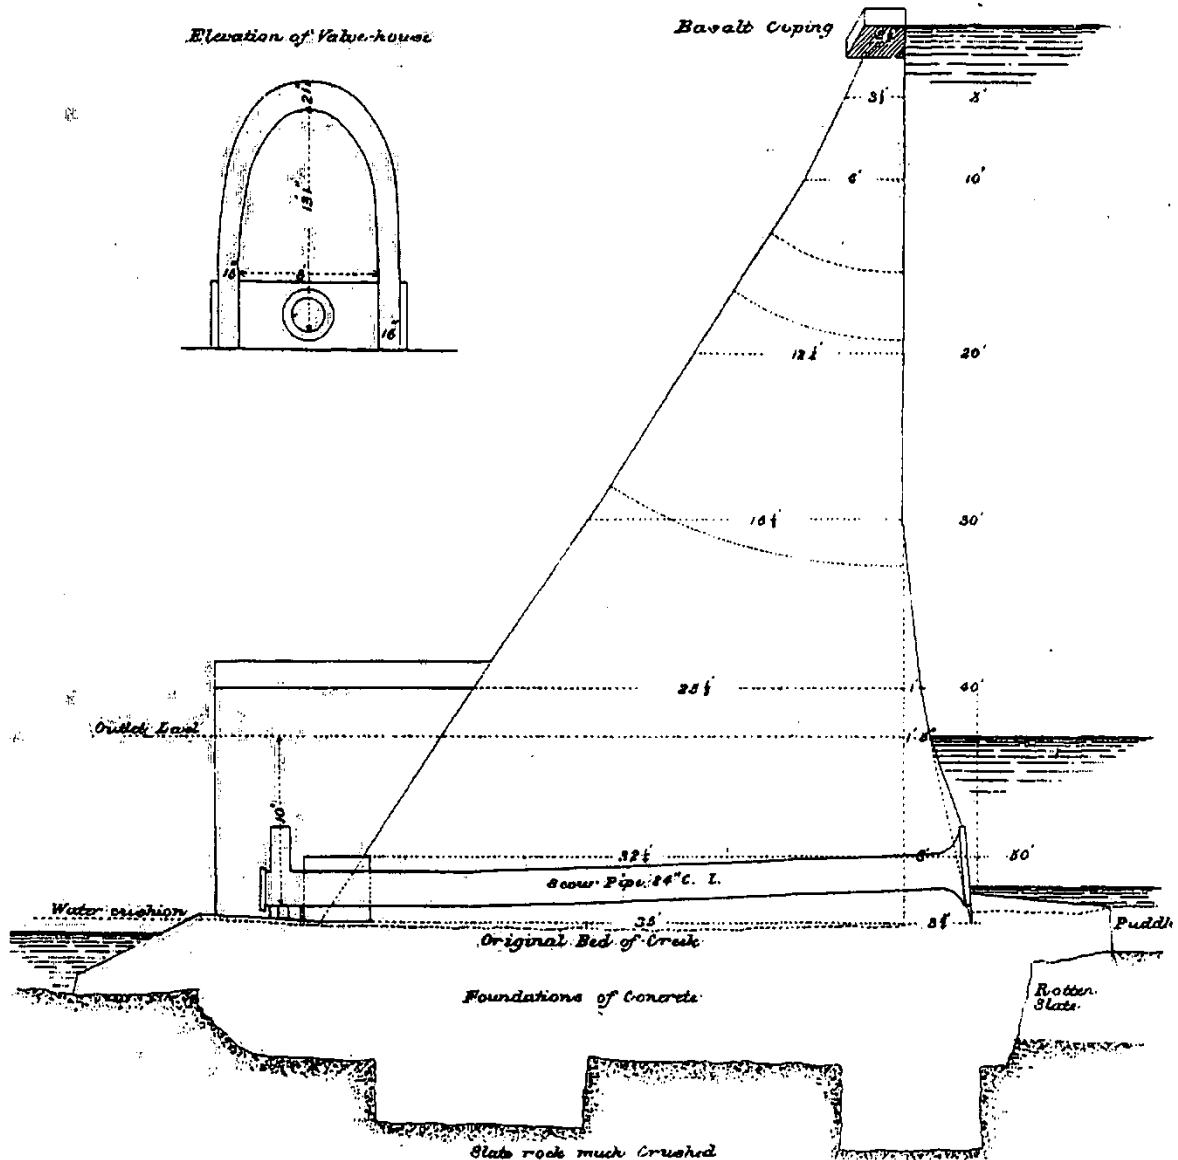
Profile of Lower Stony Creek Dam showing keyed foundation.
